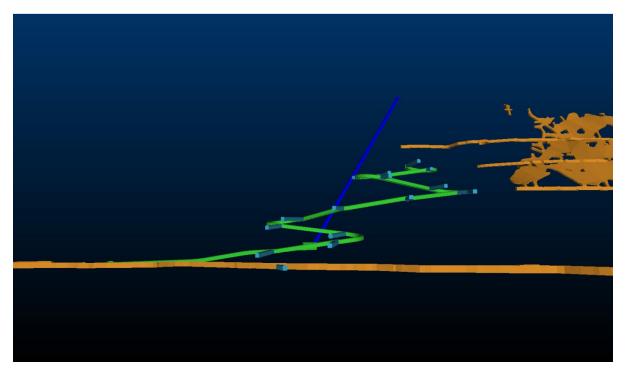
Lucky Queen Development Plan Conceptual Cross Section
